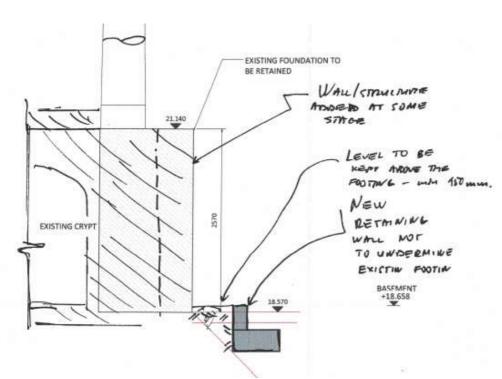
Proposed Work in the Area to the West of the Colonnade
